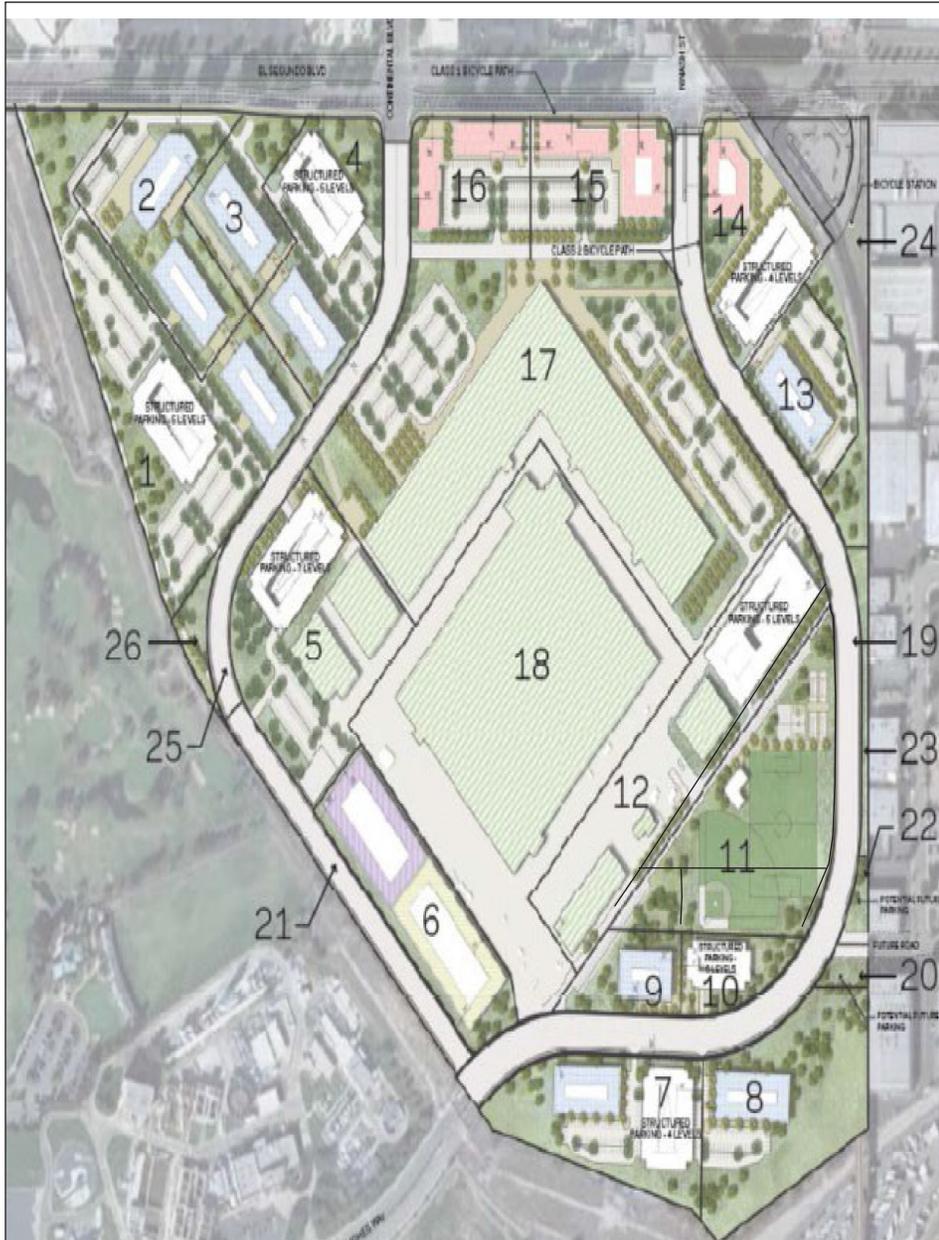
REVISED CONCEPTUAL SITE PLAN
